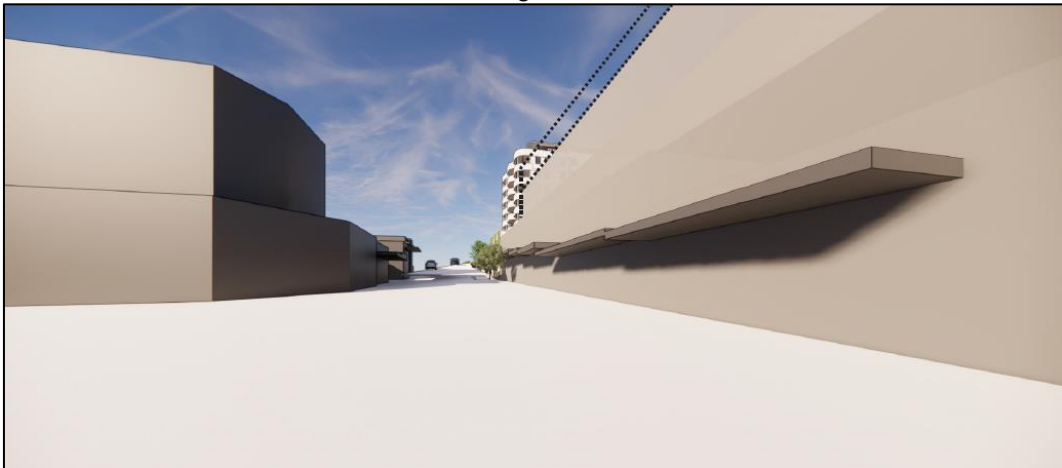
Side Elevation - The Concept Proposal, as viewed from Roberts Street
